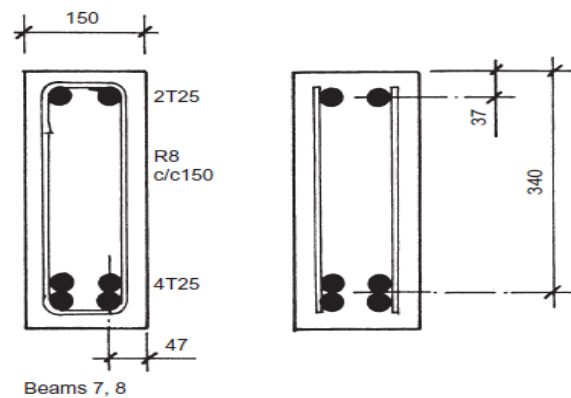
Beam cross section showing stirrups configuration (Regan et al. 2004)
